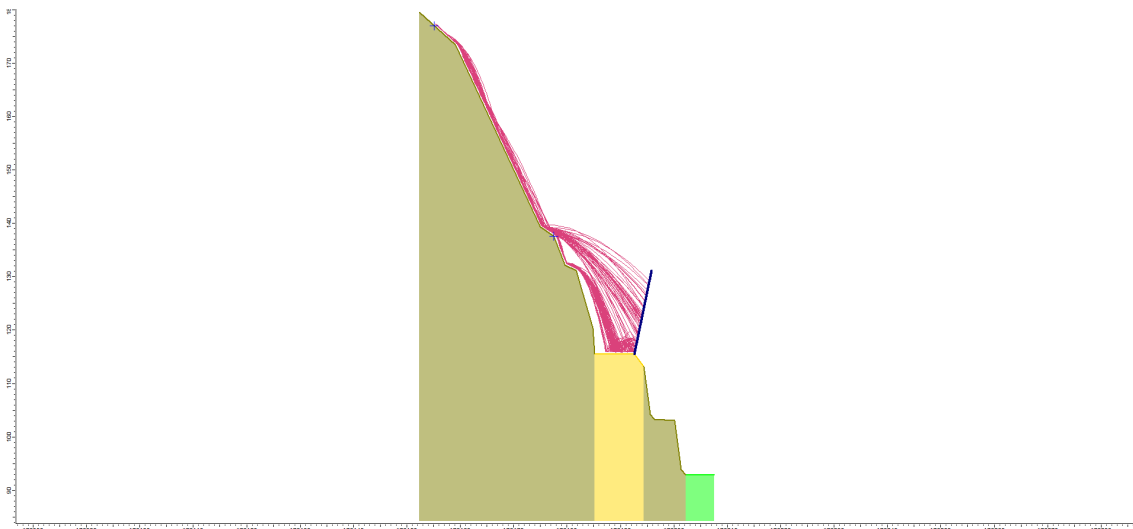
Right cross-section of the slope showing suggested location of the barrier and how it would control/block rocks
